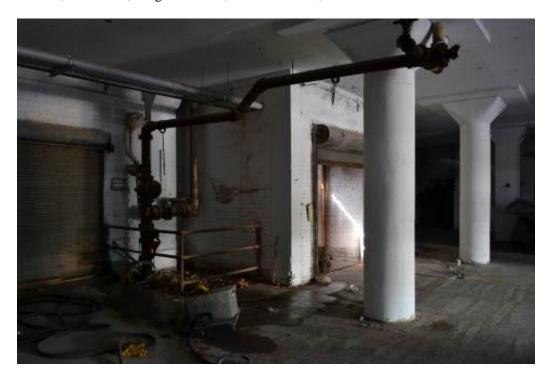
Interior, Second floor, view east from the southwest corner, 2015.
